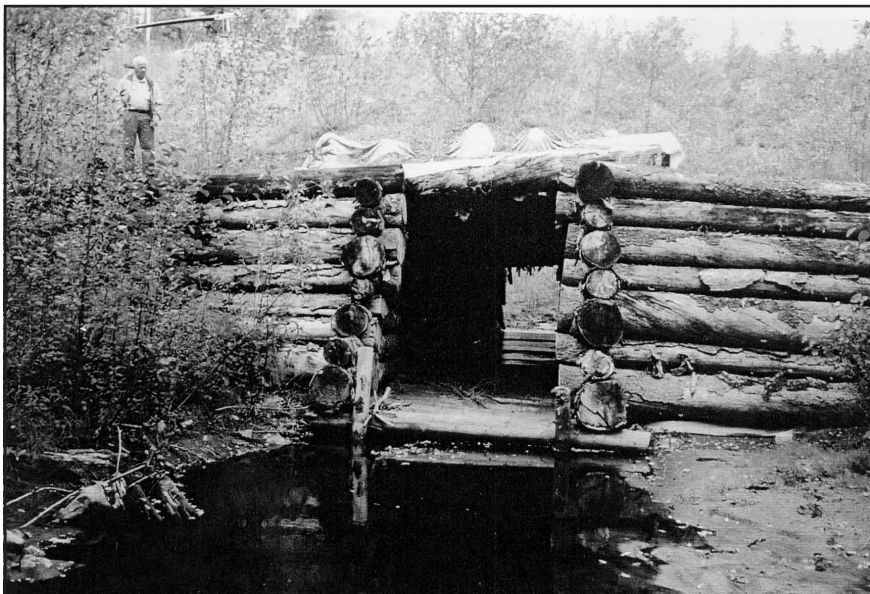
A view of the outlet of the box culvert crossing on Stubby Creek.
